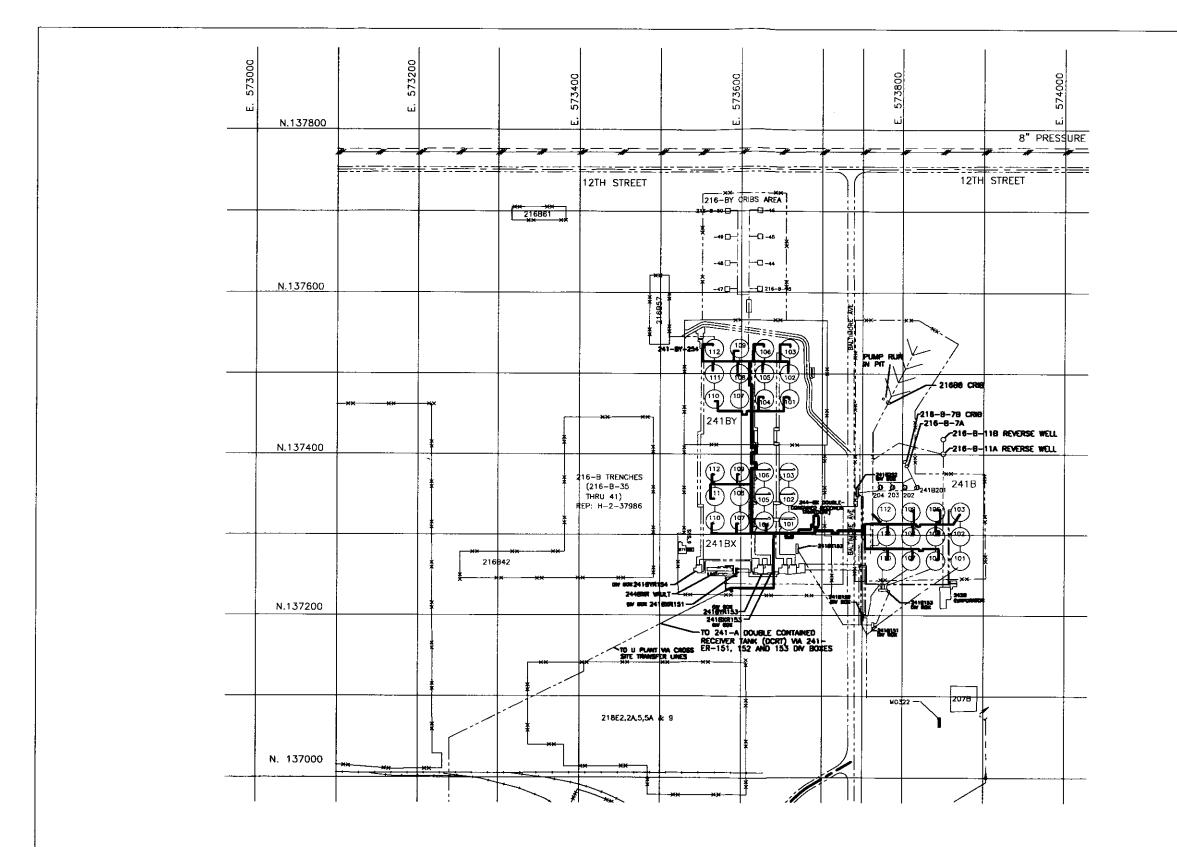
, SH 1/2 FACILITIES CONSTRUCTED FOR TANK STABILIZATION (SALT WELL PUMPING) AND ISOLATION 1975-PRESENT
